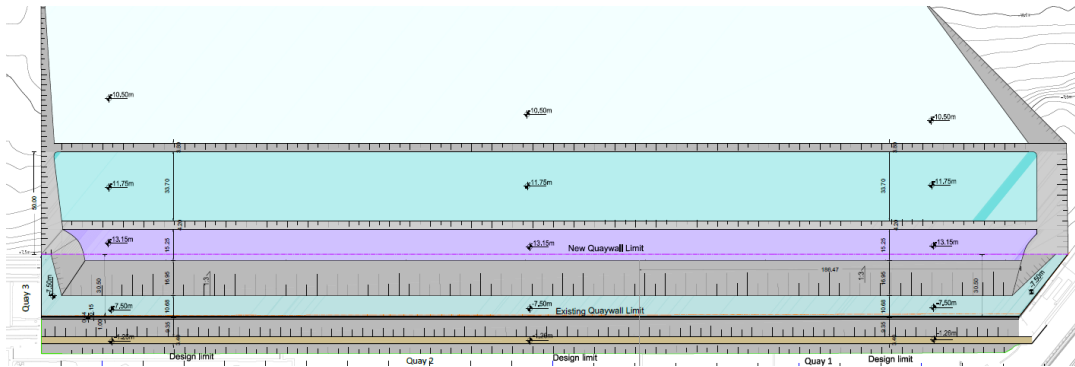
Sample of quay 1 cap beam sheet pile wall
